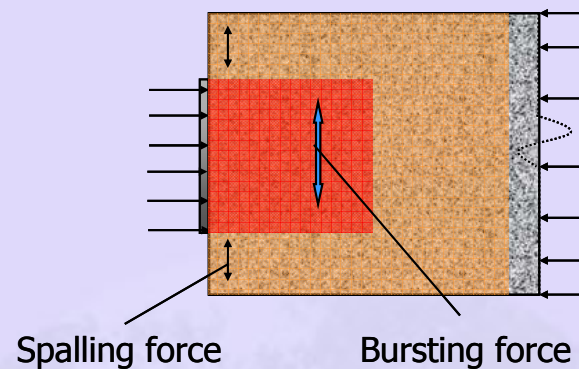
Spalling and bursting forces in the end zone
